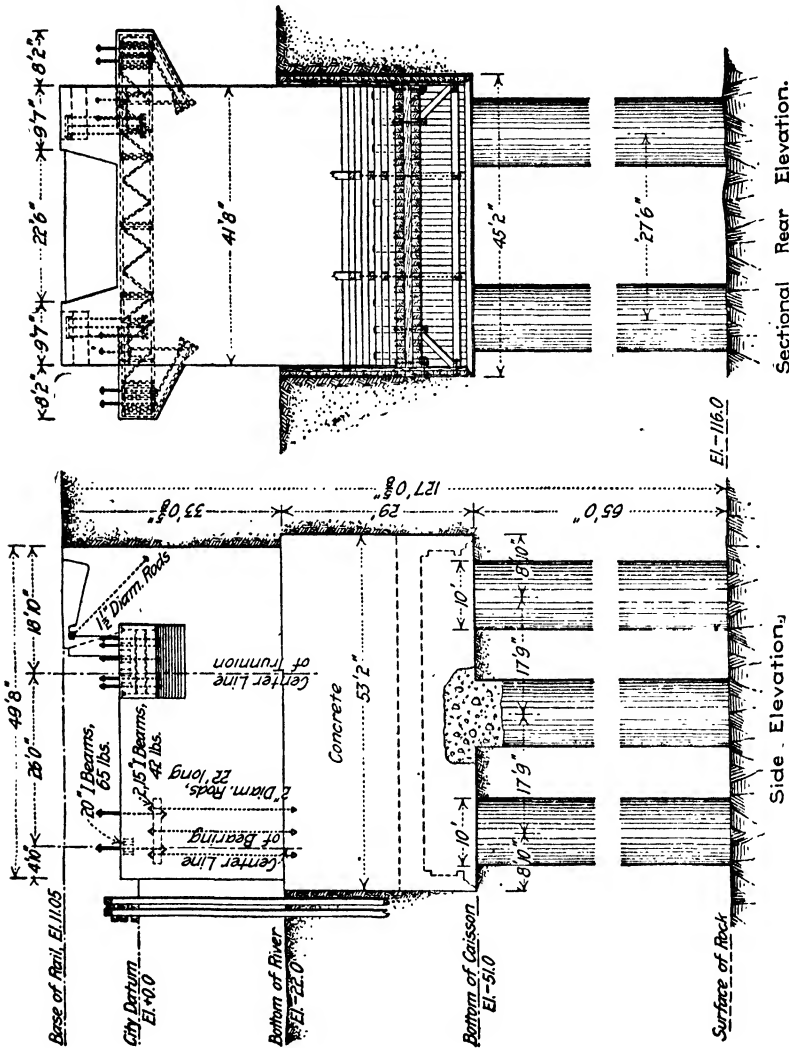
Pneumatic Foundation for Chicago and North Western Railway Bridge, Kinzie Street, Chicago.
